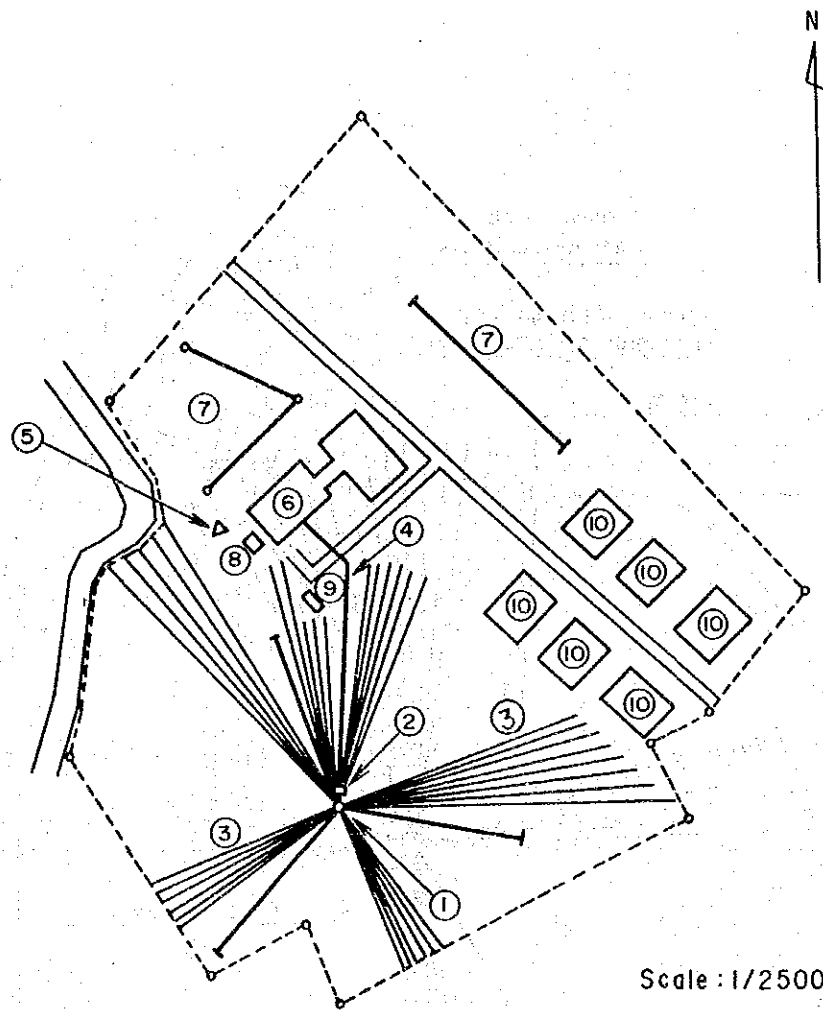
Ternate Transmitting Station ; Site Plan - I
